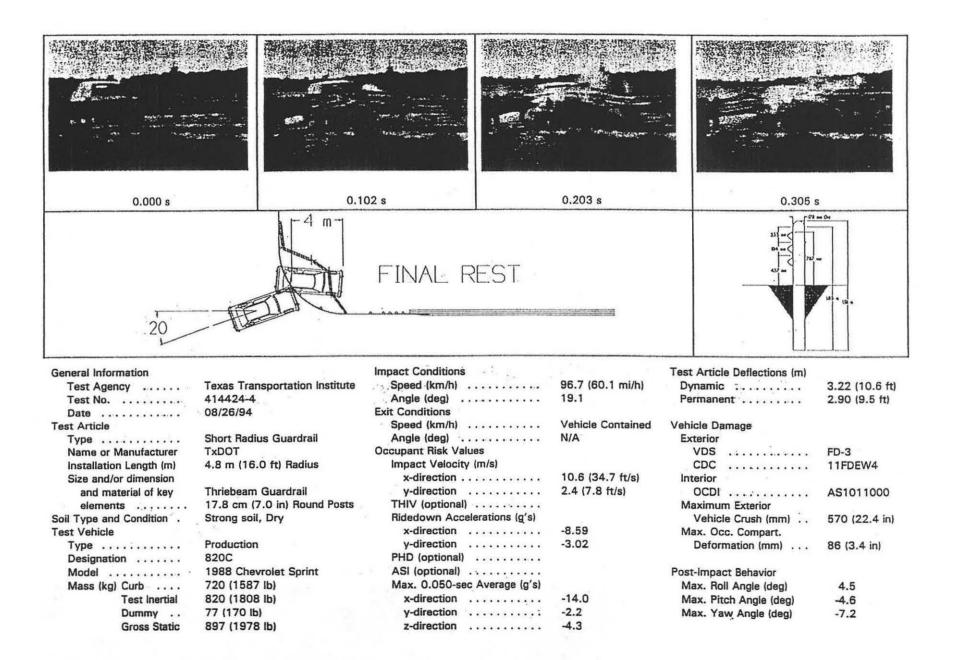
Summary of TTI W-beam Short Radius Guardrail Test 1442-4 (8)
